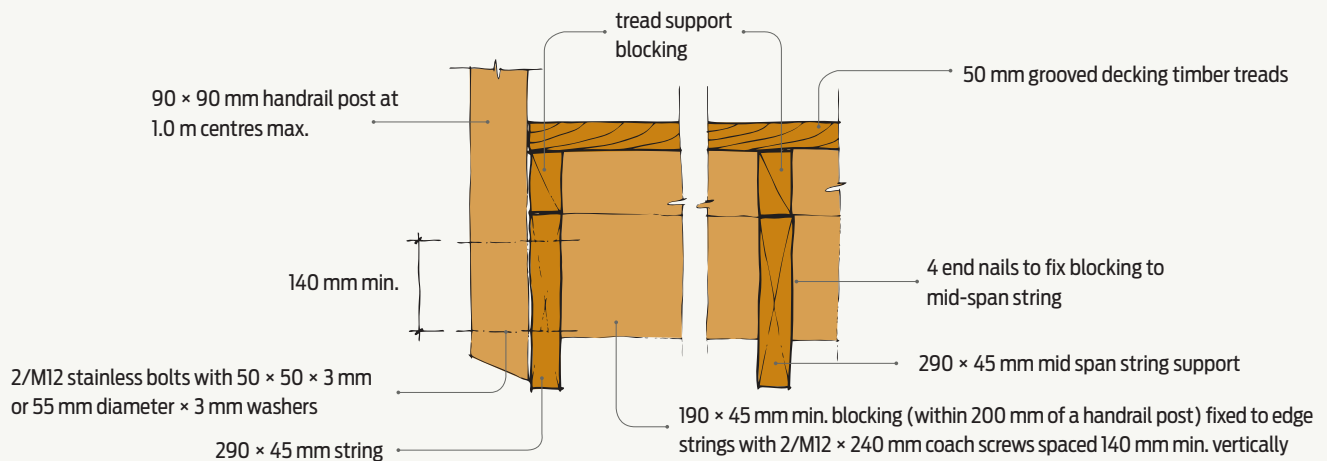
Handrail post fixing to stair string and mid-span string for wider stairs.
